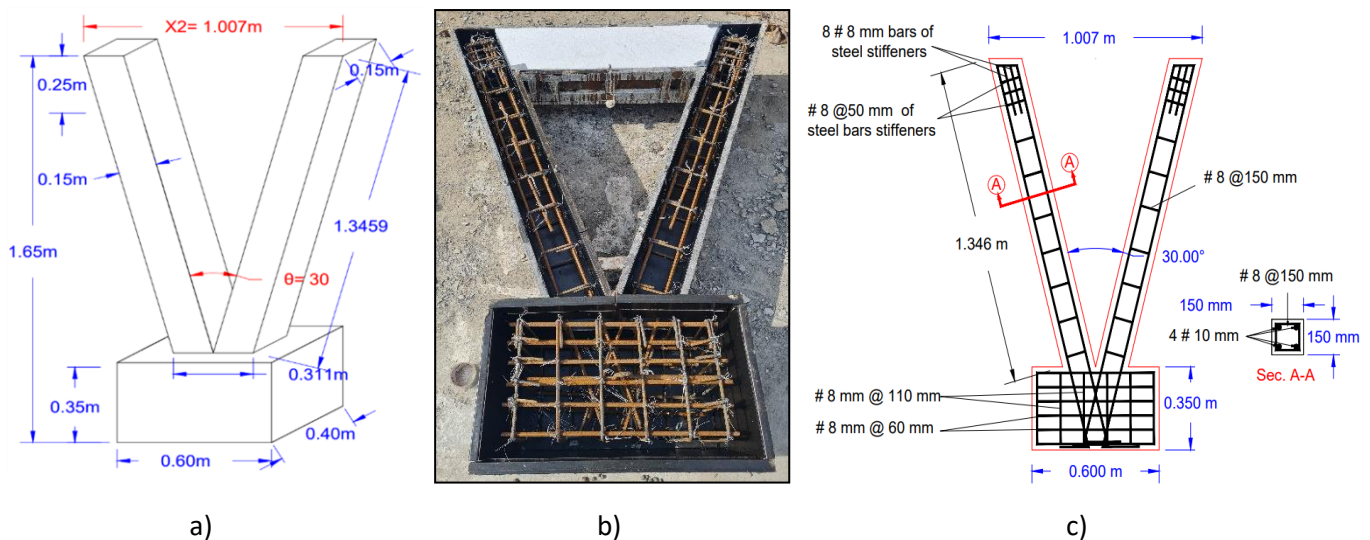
a) Configurations of V-shaped column without tie beam, b) Casting mold and c) Reinforcement details.
